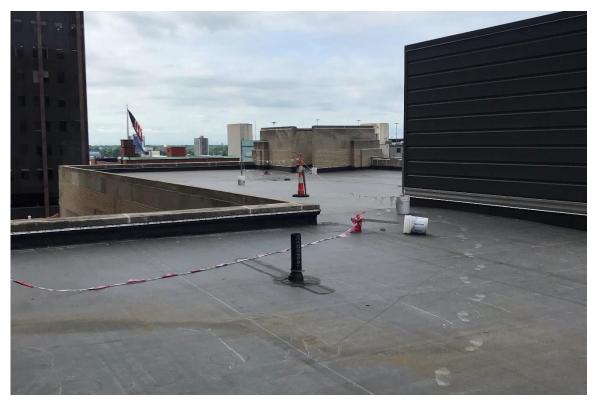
Exterior, West Roof, Looking Northeast. 7/31/19
